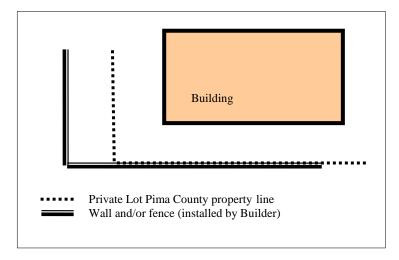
Private Lot Pima County property line beyond wall/fenced in patio or small area.
